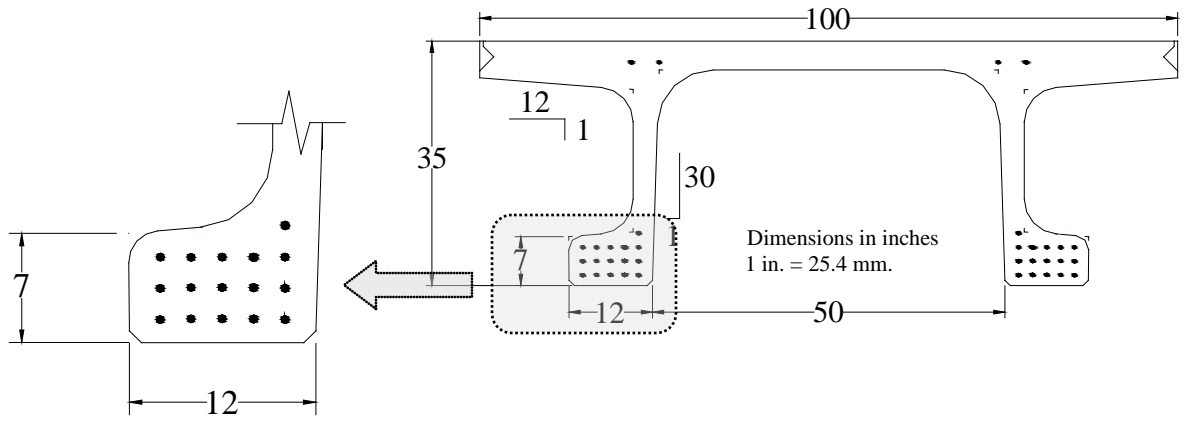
Illustration. Strand Layout of Section I for 80-foot (24.4-m) Span
